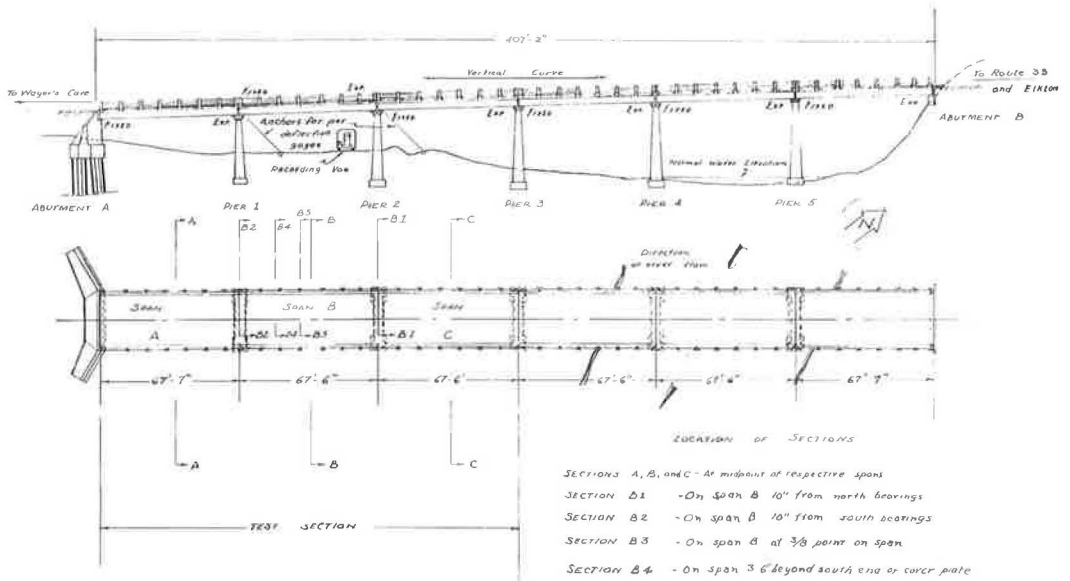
Profile and plan of Weyer's Cave Bridge, indicating test sections.
